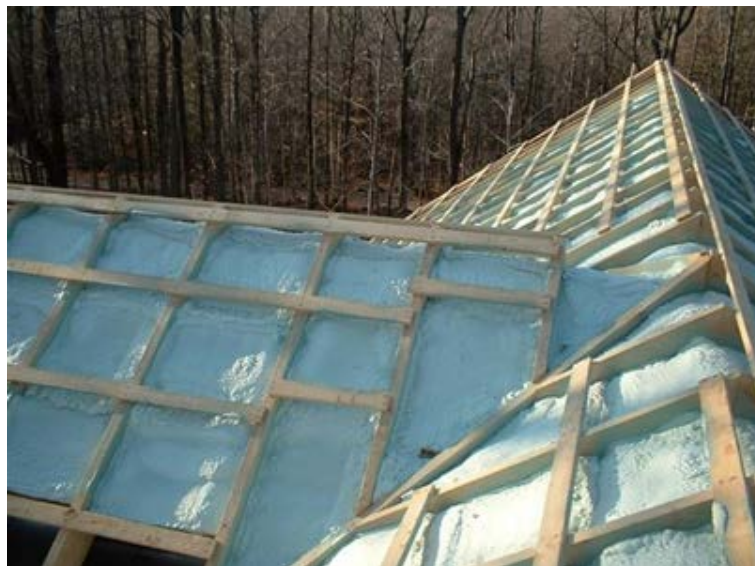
HEATLOK XT applied to a roof/ceiling prior to roofing
